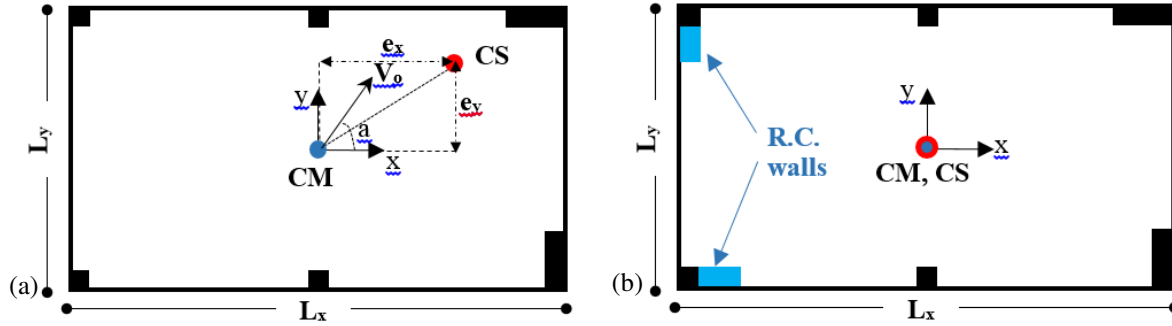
Plan layout (a) of the existing building; (b) of the retrofitted building (eccentricity elimination).
